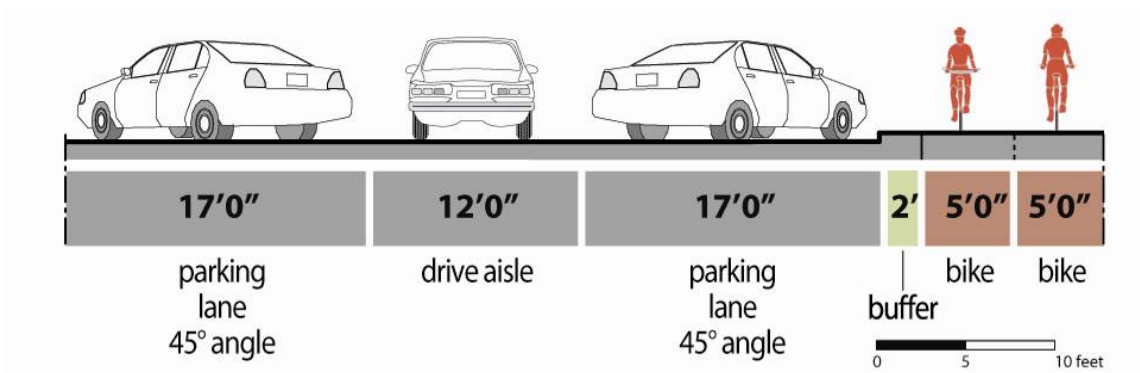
Segment 1B Parking Lot 1 Proposed Improvements
